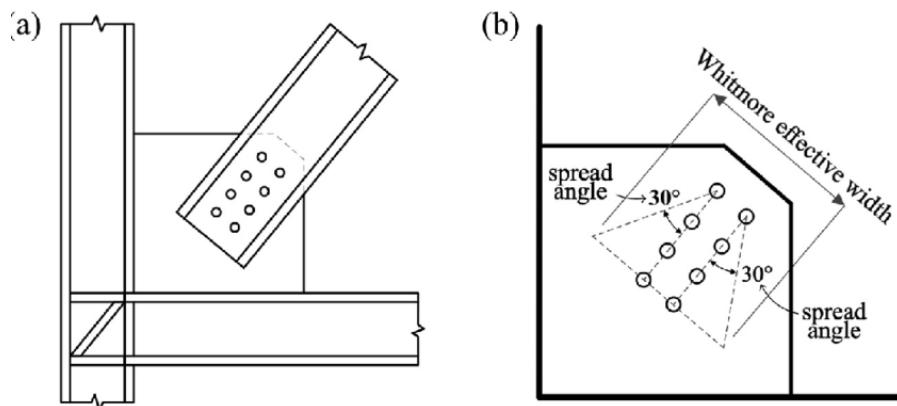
Whitmore section for a gusset plate with bolted connection (Wang et al., 2023)
